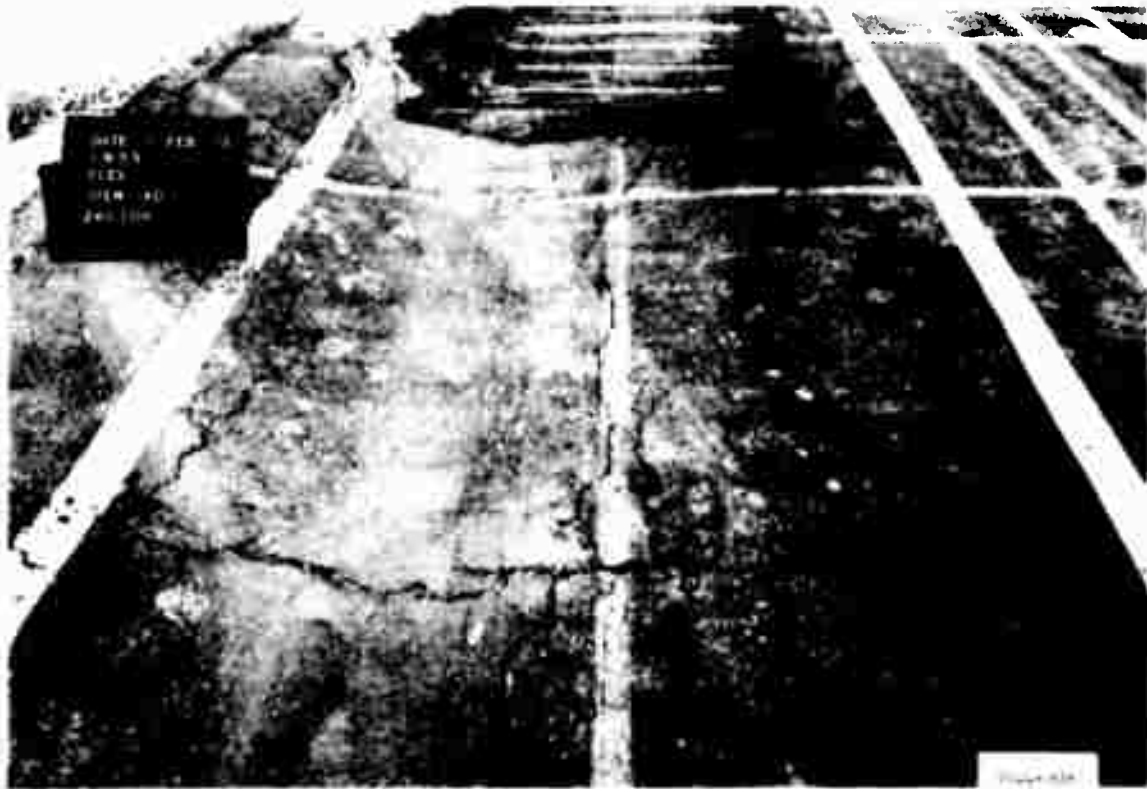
Cracking in subitem 4d, lane 3, flexible pavement test section, at failure after 240 coverages of 50-kip single-wheel assembly
